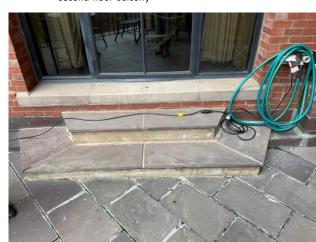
Slippery and loose pavers at edge and stairs pose potential tripping hazards.
